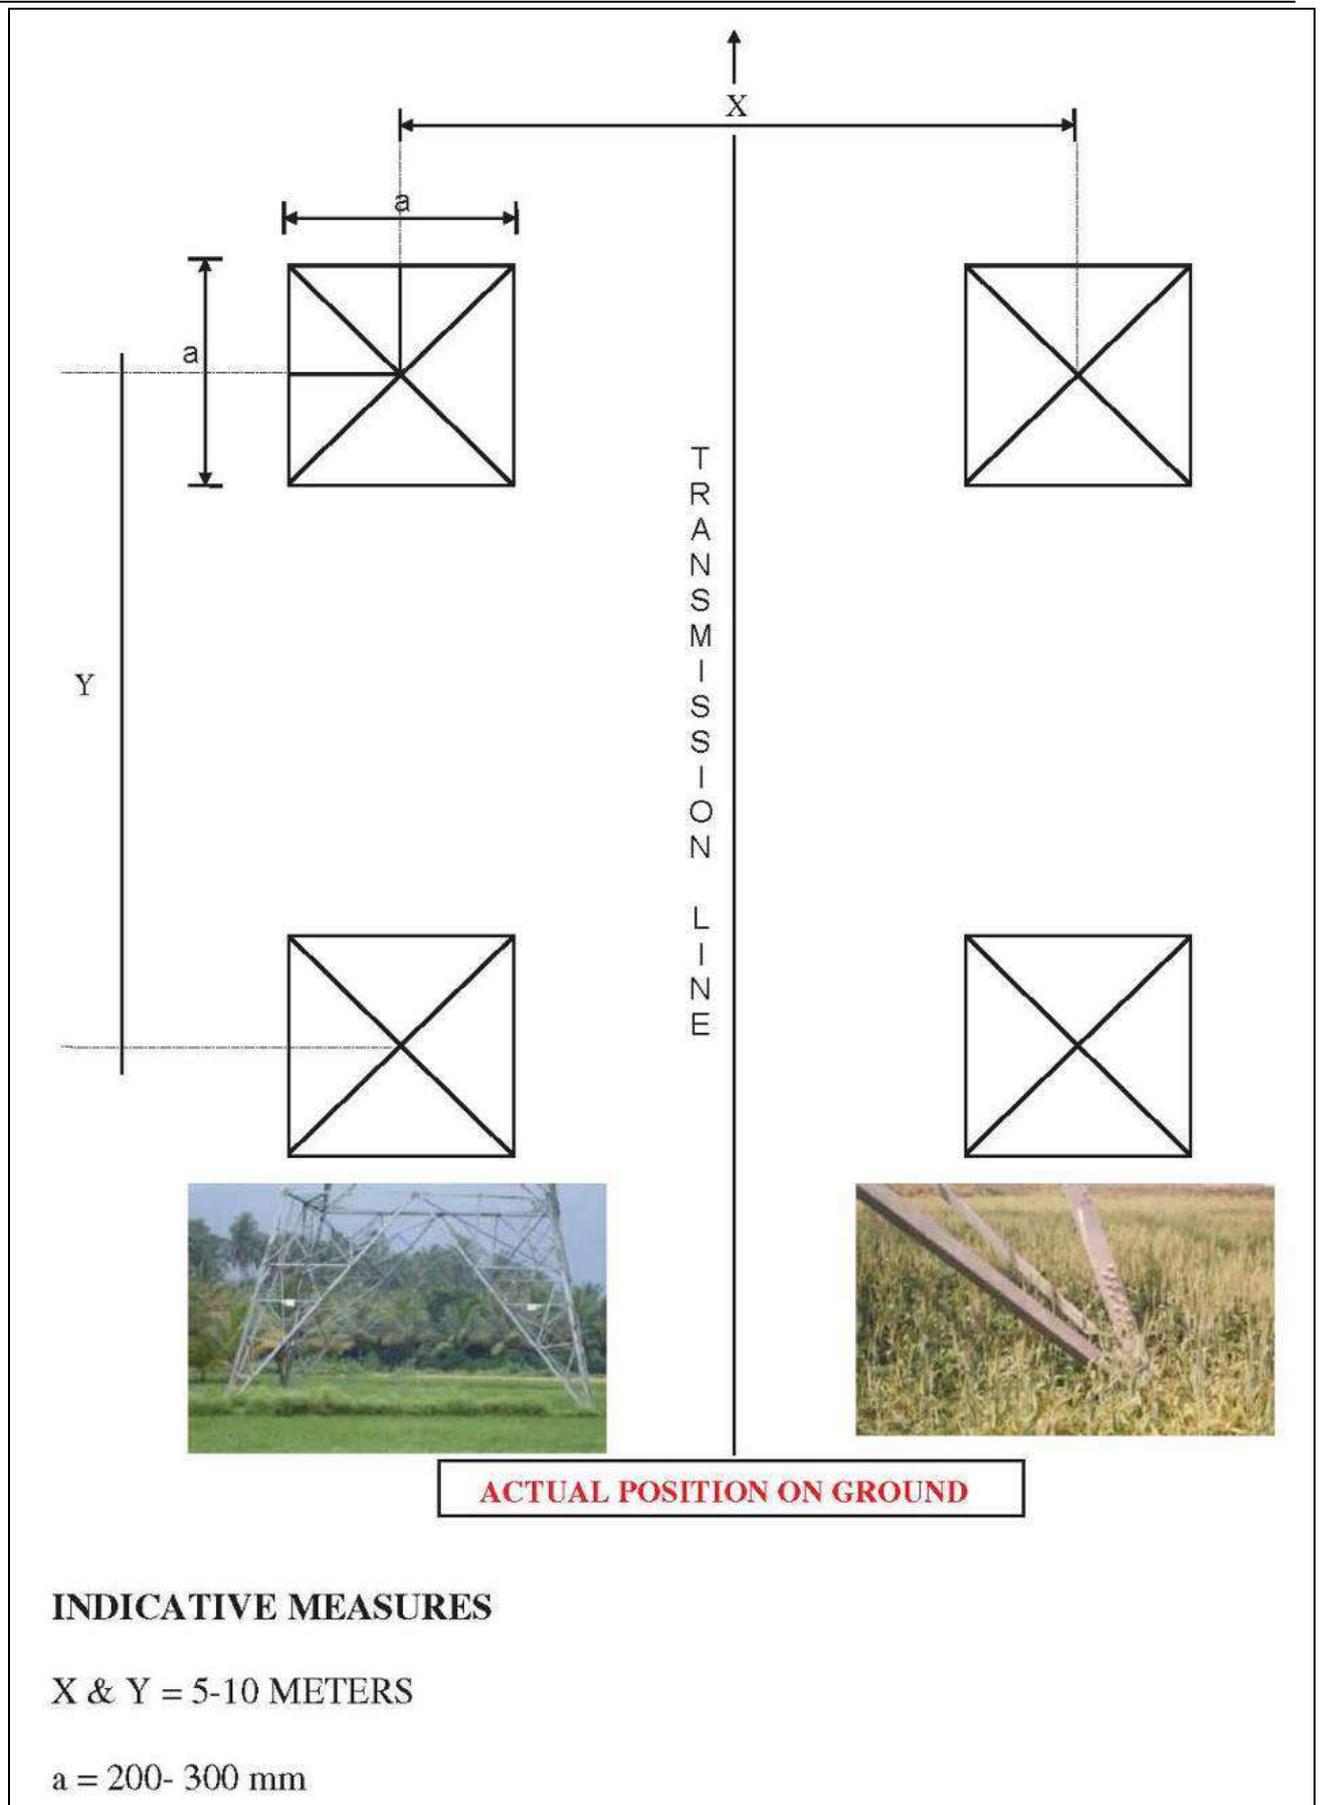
Typical Plan of Transmission Line Tower Footing
